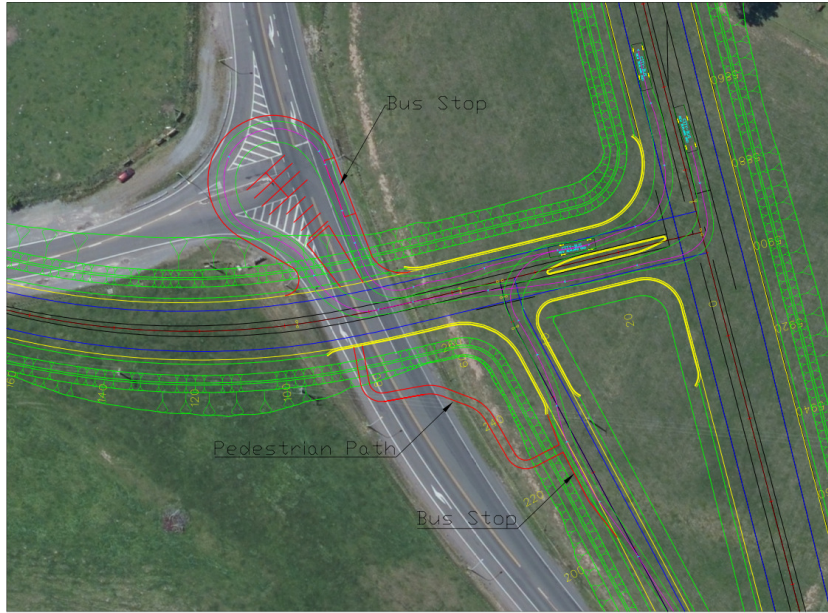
Potential Bus Stop Layout at Waitarere Beach Road
